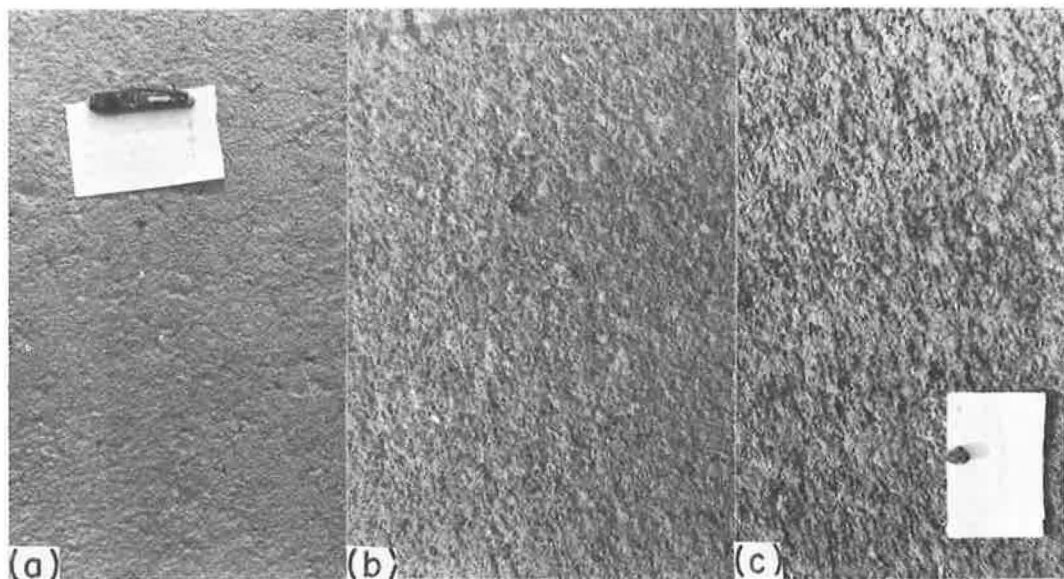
Turning tests on bituminous concrete surfaces after (a) 25 applications, (c) 125 applications, and (c) 250 applications.
